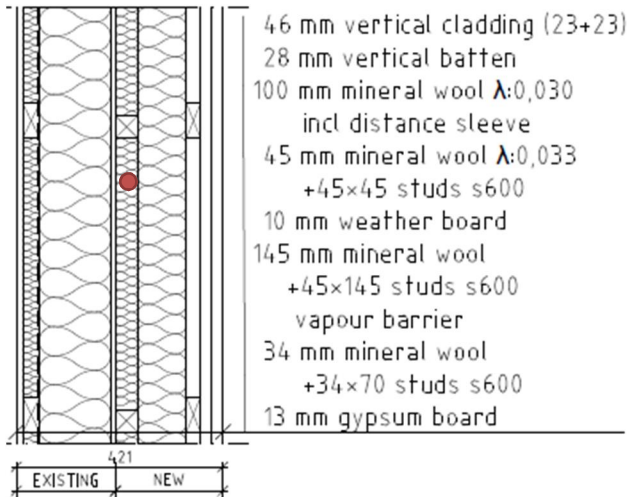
RH2 - Wooden frame construction from the seventies, after renovation
